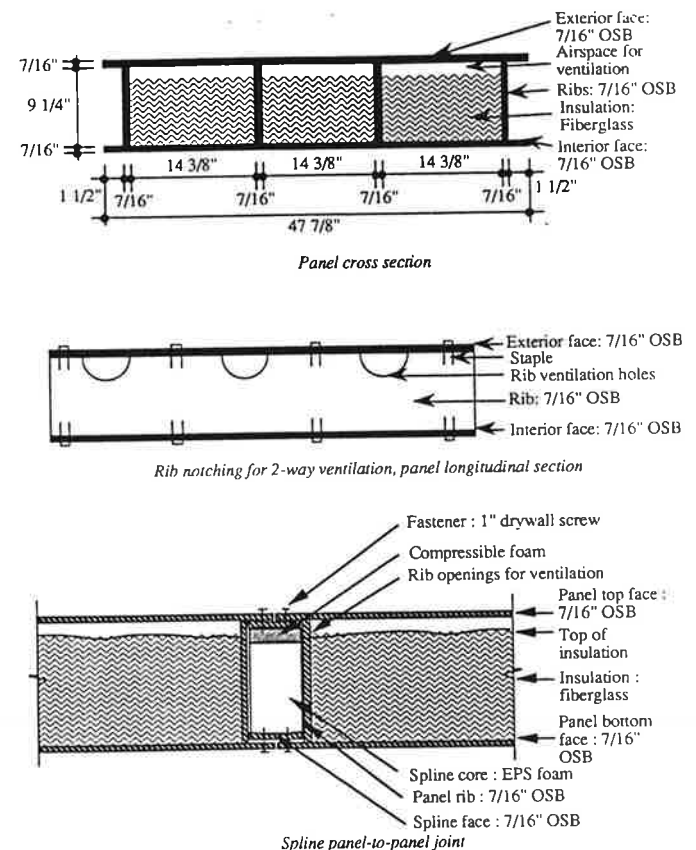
Panel cross section, rib notching for two-way ventilation, panel longitudinal section, spline panel-to-panel joint.
